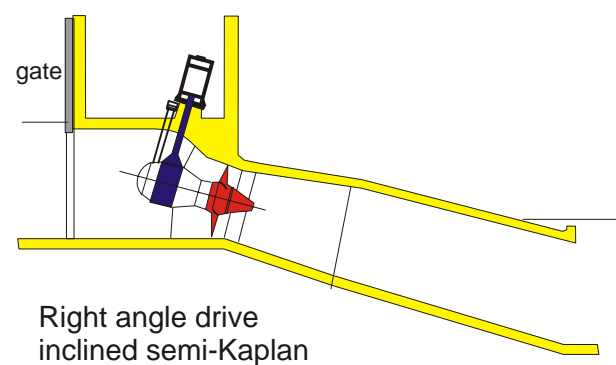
Cross section of an inclined right angle Kaplan power plant
